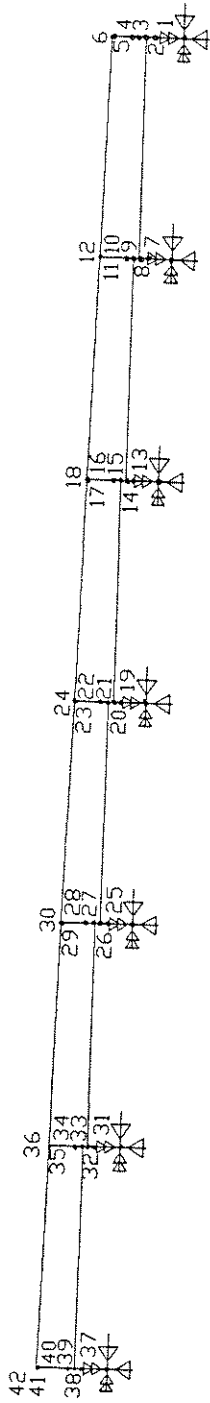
Frame-Type Model for Deck and Girder at Pier
